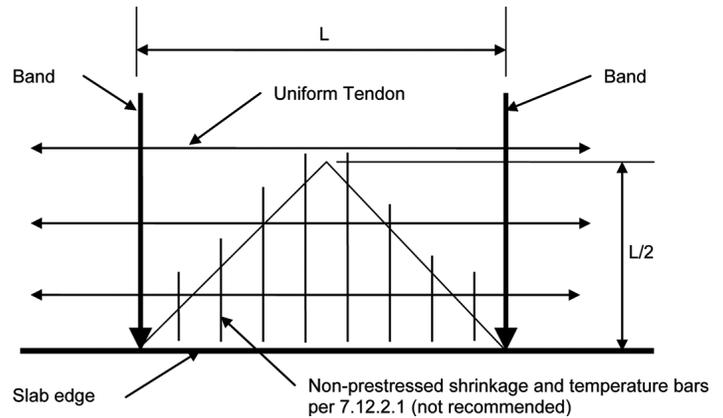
Plan at slab edge of two-way slab with added S&T reinforcement.
